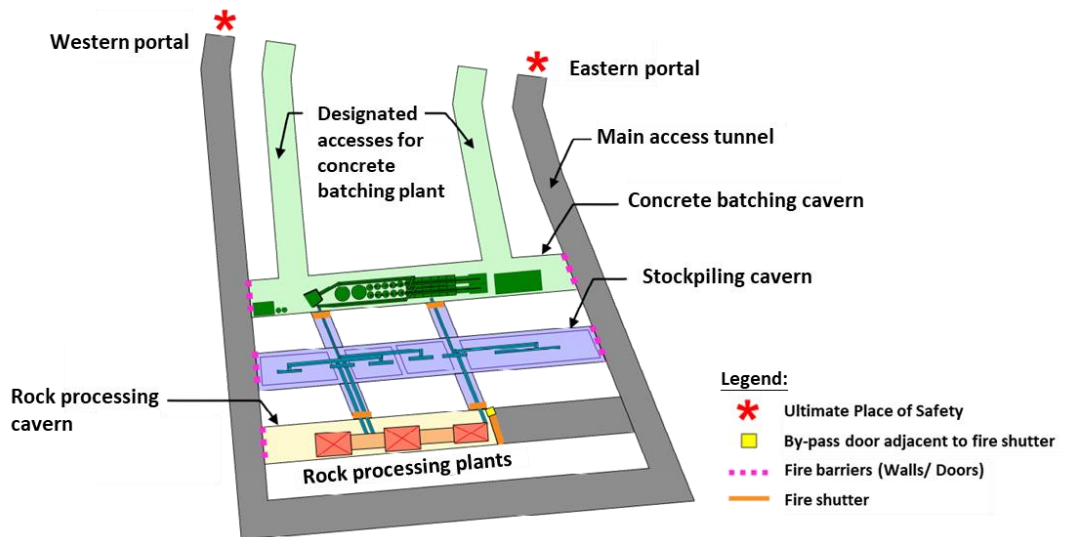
Layout of housing rock processing and concrete batching plant in caverns
